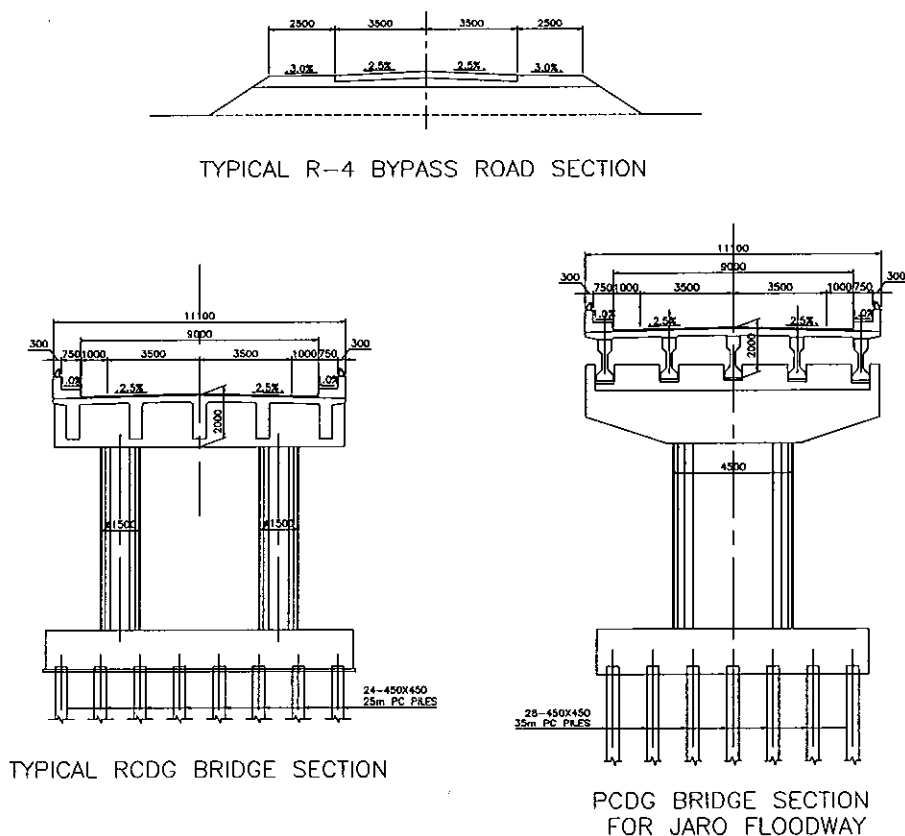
TYPICAL R-4 BYPASS BRIDGE SECTION FOR INITIAL STAGE
